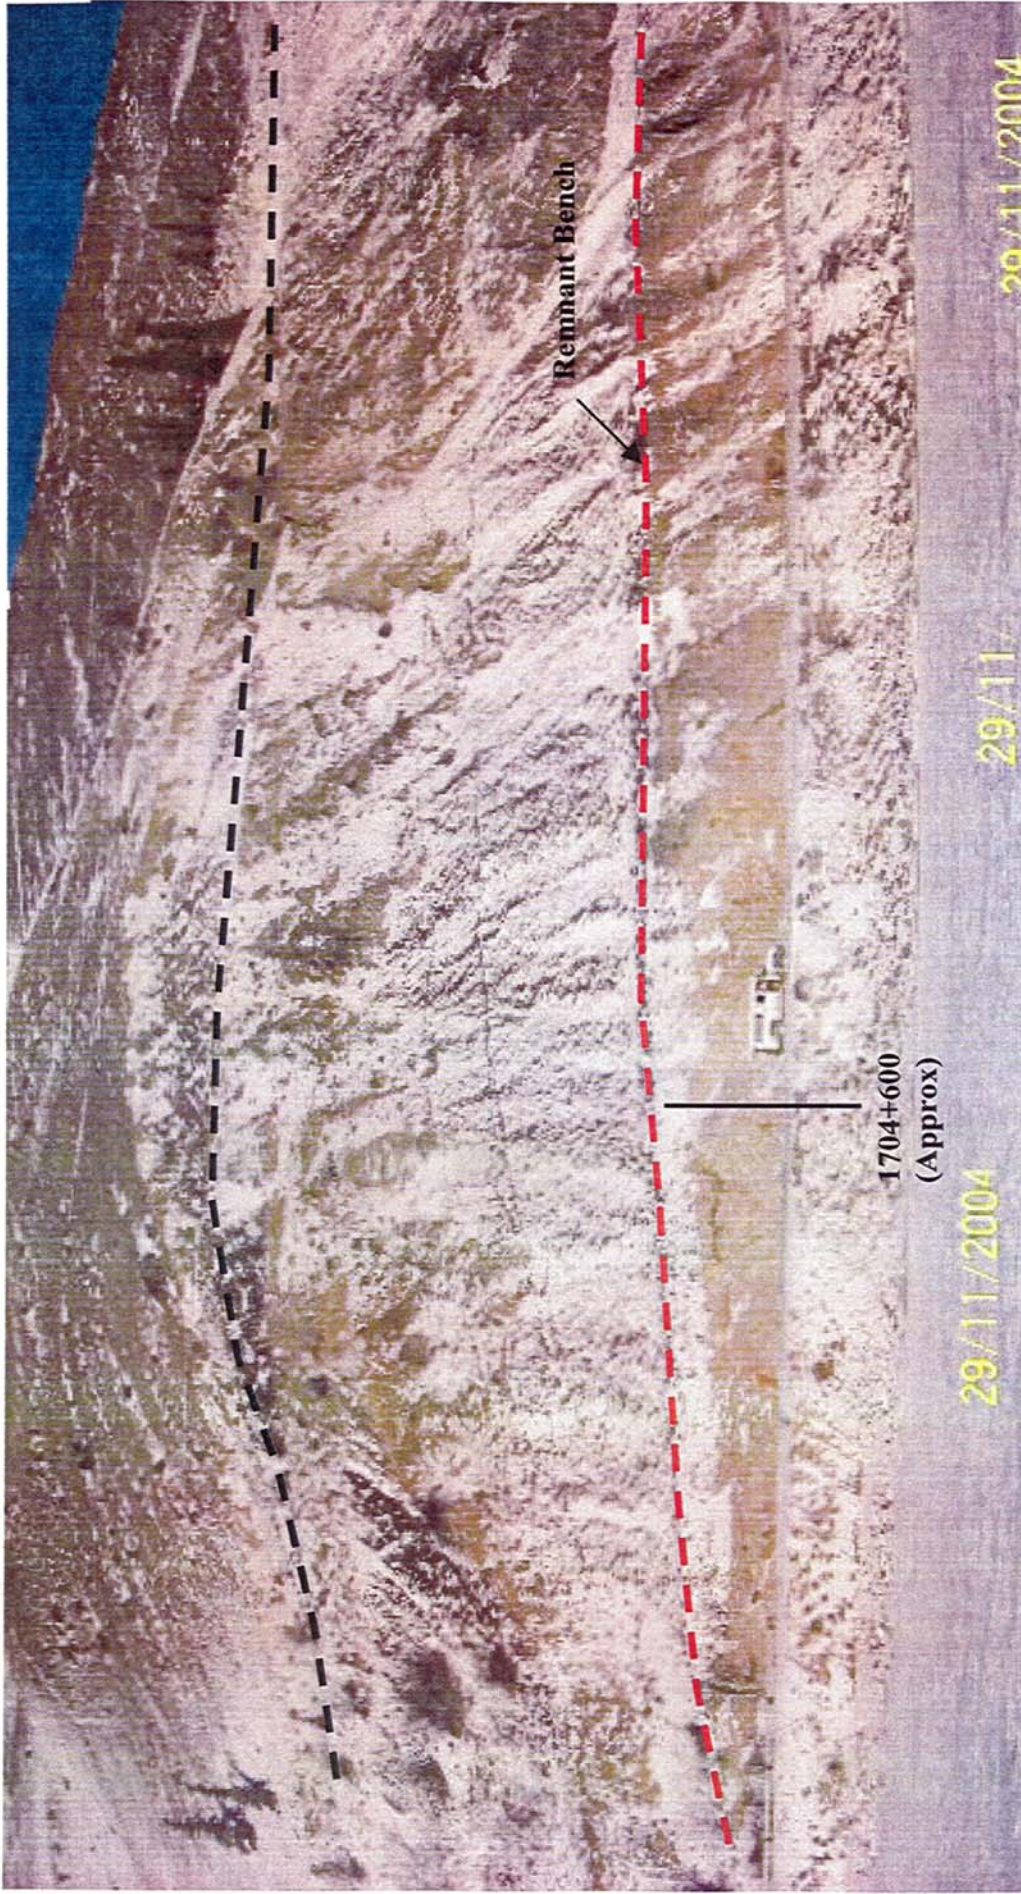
Note Remnant bench or construction access trail from construction of existing rock cut.
